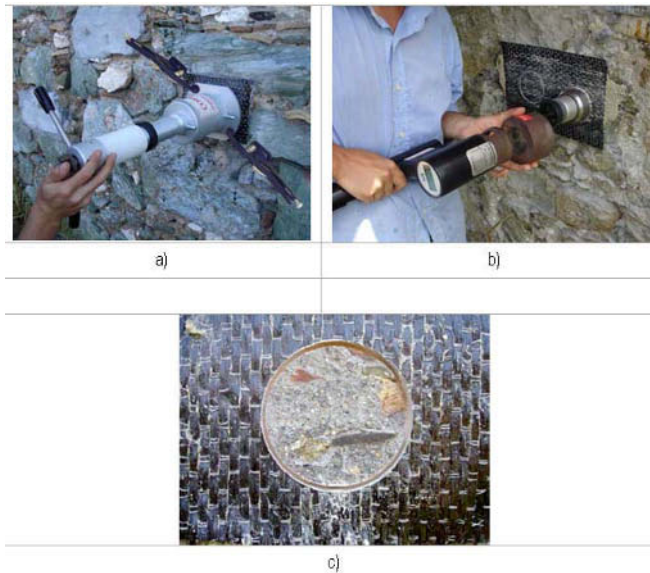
Pull-off test on a masonry building: a) FRP and substrate cutting; b) steel plate adhesion on FRP system; c) test result.
